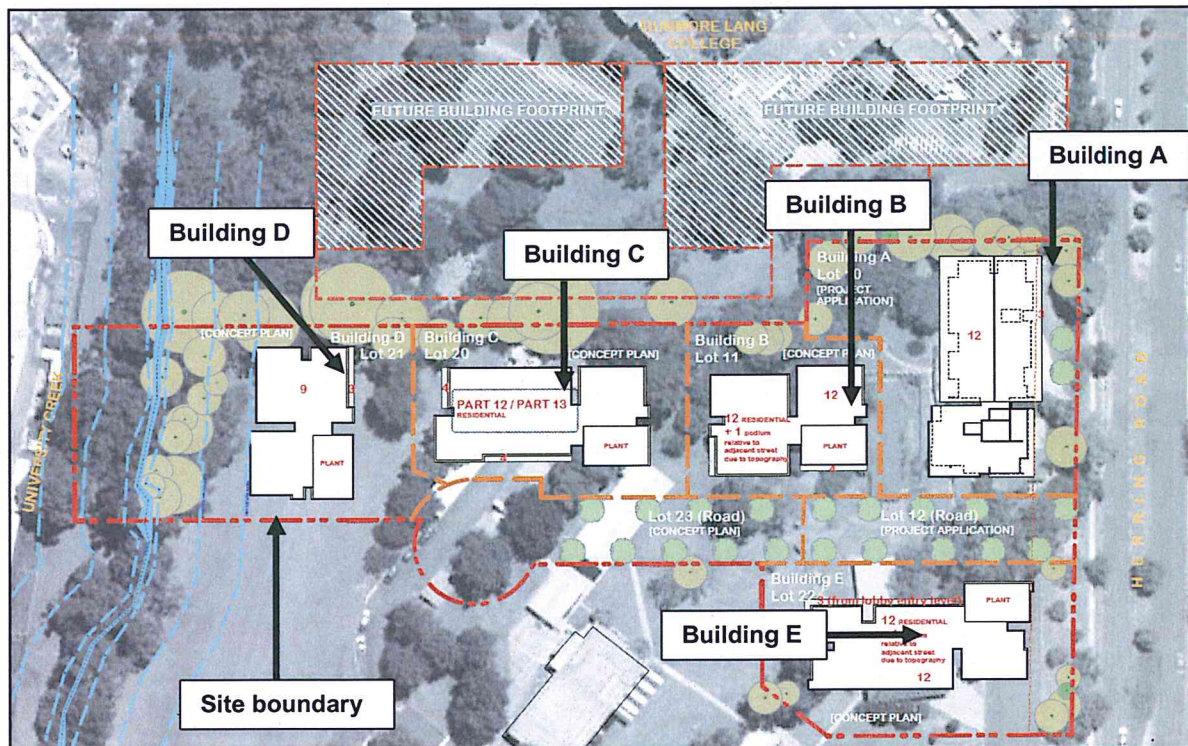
Site Context Plan Demonstrating the Layout of the 5 Buildings and Internal Road
